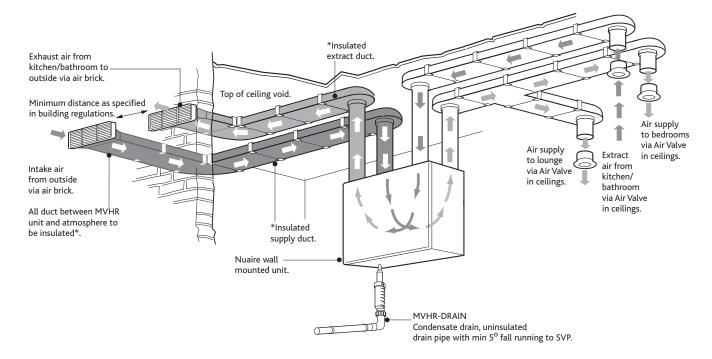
Typical ducted arrangement for a wall mounted unit using rectangular ducting.
